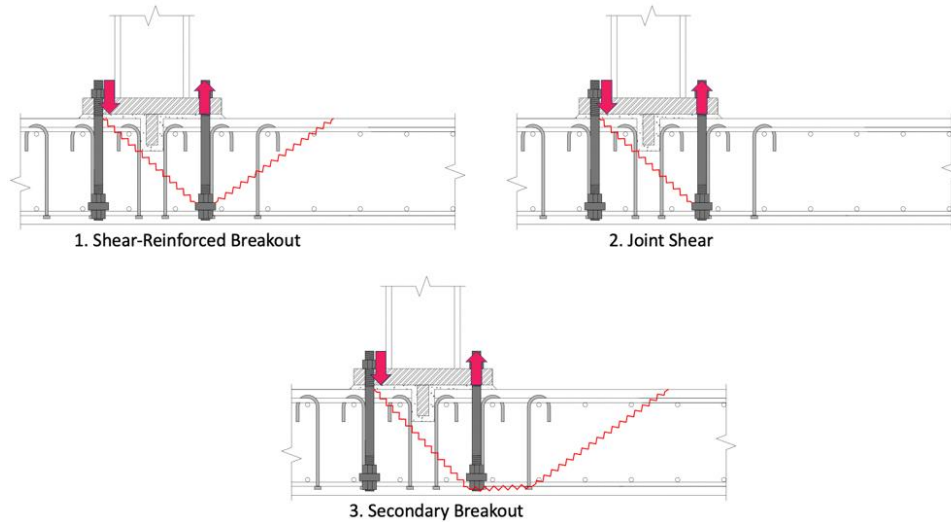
Possible concrete failure modes for shear-reinforced column-foundation connections
